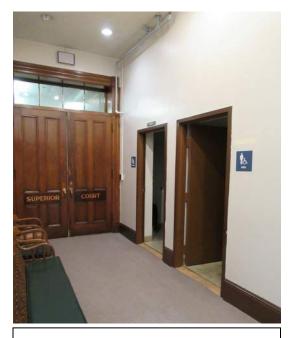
Interior hallway, looking west. Pair of doors are incorrectly labeled
